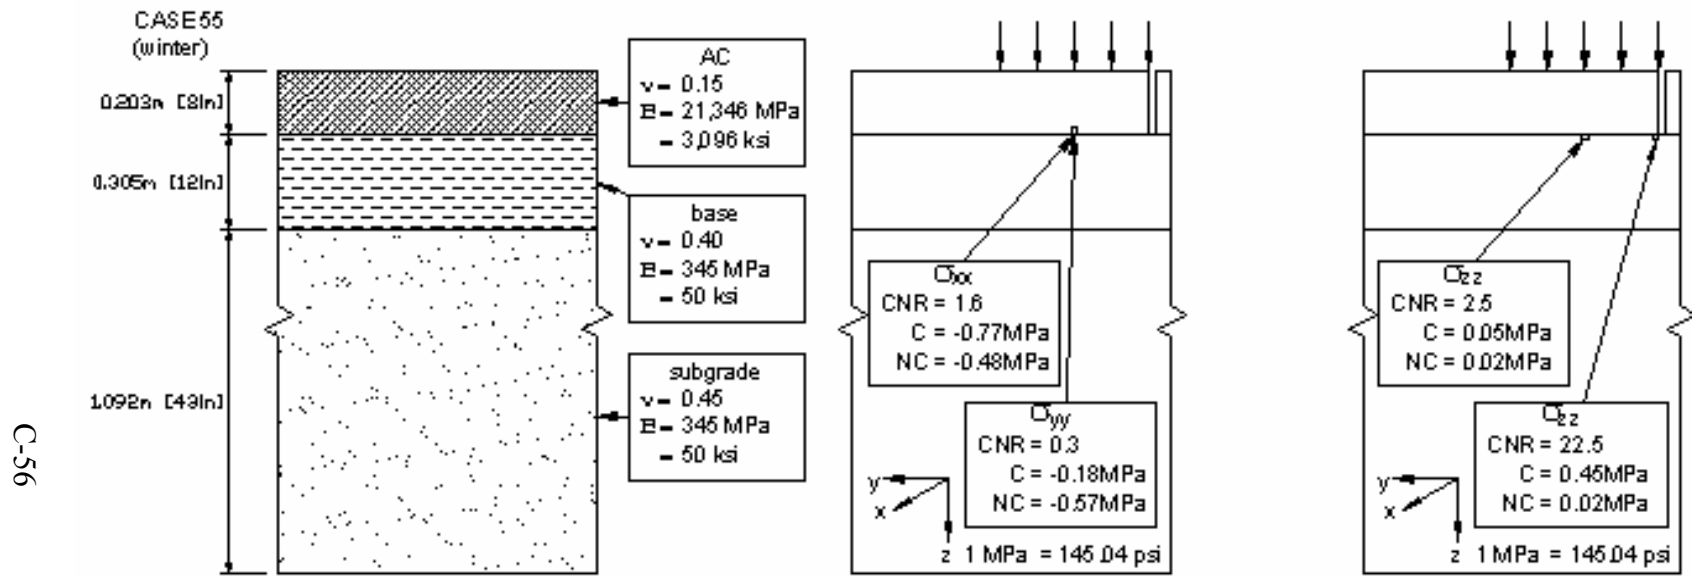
Summary cross section for case 55, (C – stress in cracked pavement, NC – stress in pavement with no crack, CNR – crack/no crack (stress) ratio)
